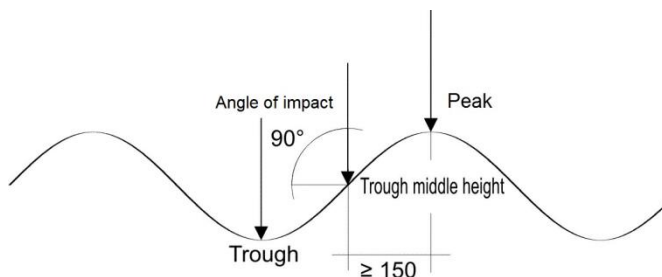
Target areas and angle of impact for a profiled plastic sheet used as a roof component (in this example, a corrugated plastic sheet); cross section (dimensions in millimetres)
